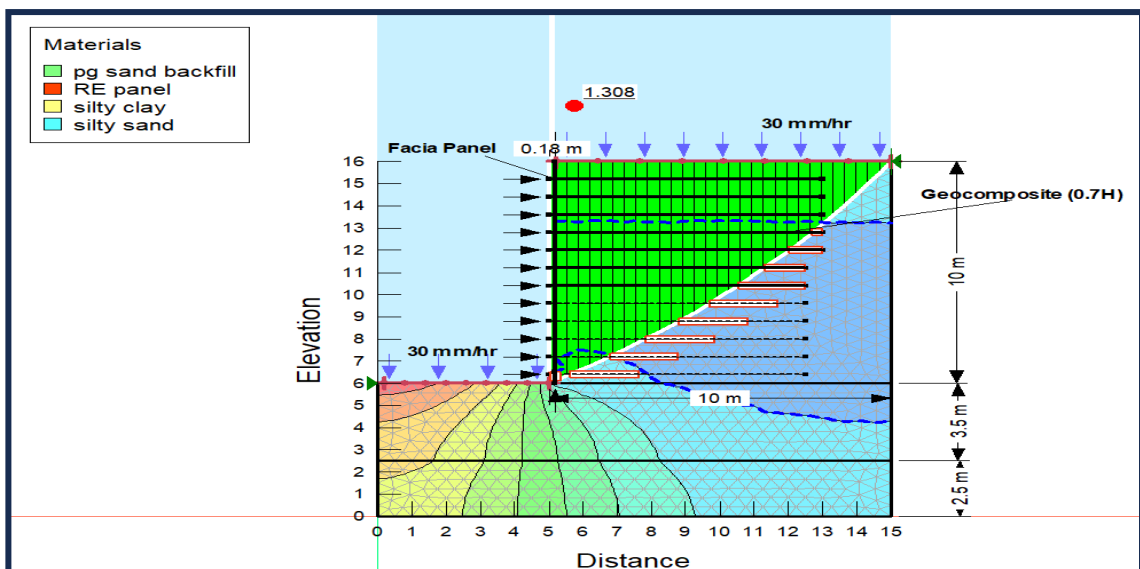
Reinforced Earth Wall with reinforcement (Geocomposite) under heavy rainfall F.O.S more than 1.
